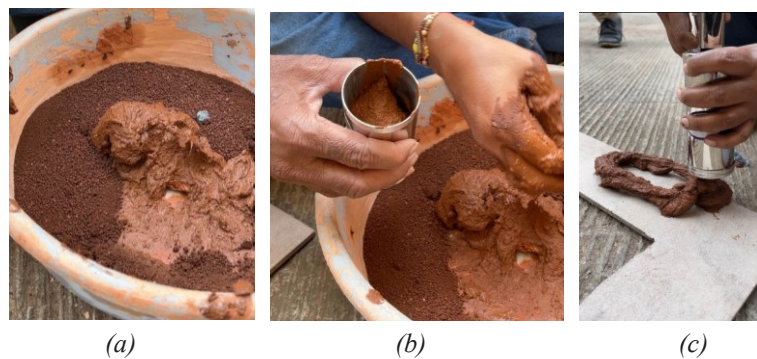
(a) preparing design mix; (b) filling design mix in machine; (c) 3d printing block sample
